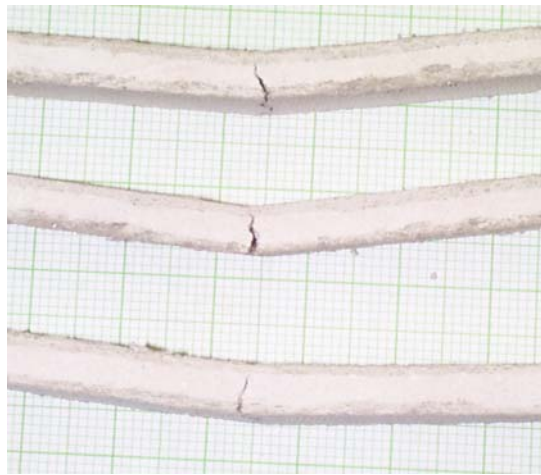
Fractured specimens from fiber reinforced gypsum wall panels in Module S-2
